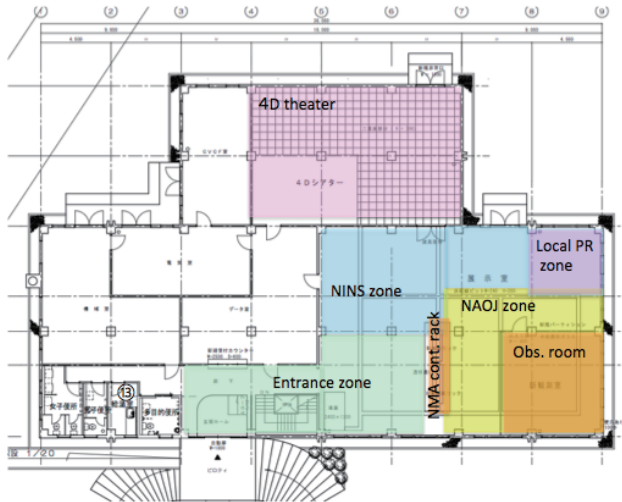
Layout plan of exhibition area in the NINS PR Center.
